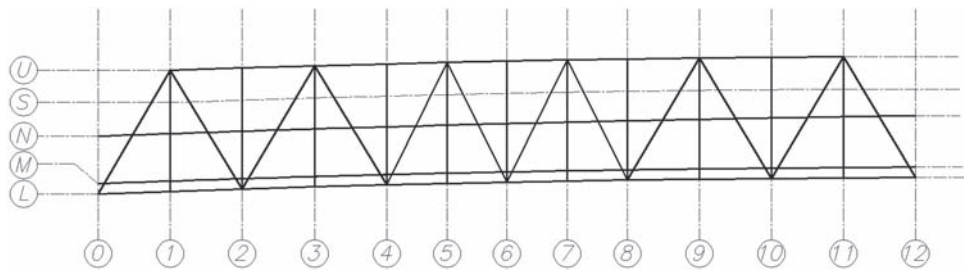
Joint and member naming convention for the Little Mystic Span model.
